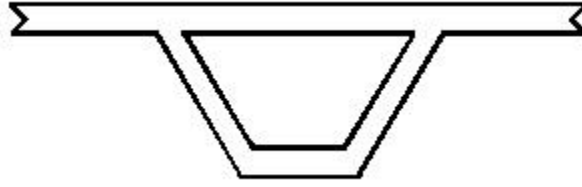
Trapezoidal beam cross-section proposed by Badie et al (1999)
